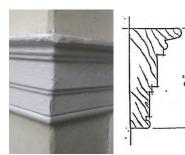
Room 104 rail. (GWWO photo, 2005.); and section detail.
